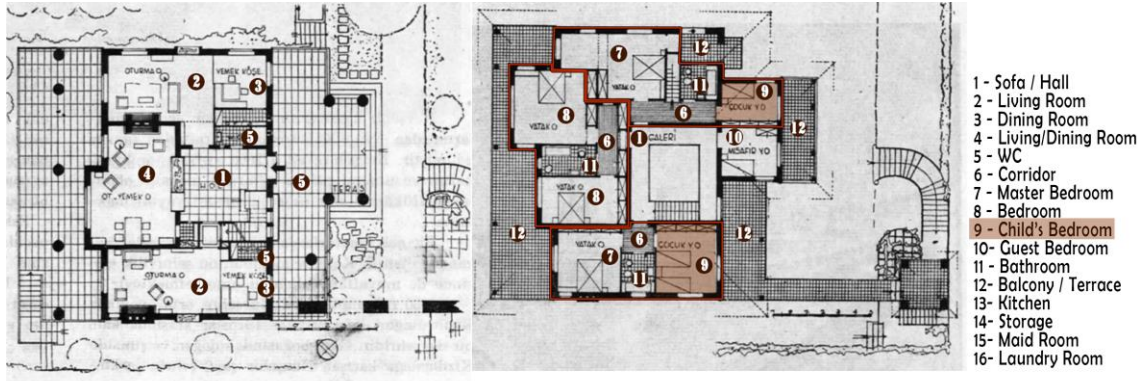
The ground and first floor plans of a House in Büyükkada, İstanbul (Arkitekt, 1946, 9-10)
